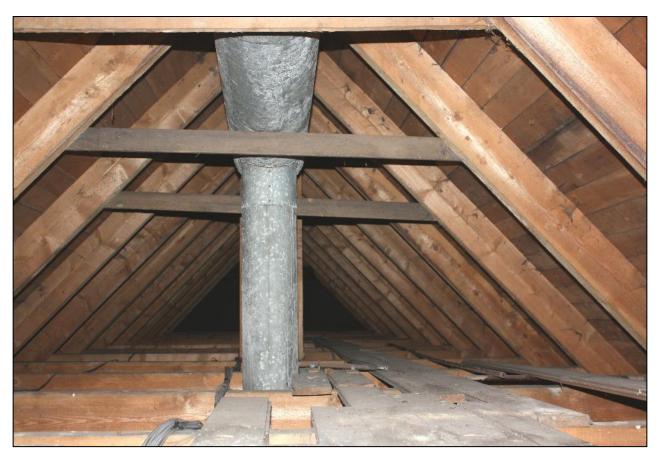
View looking towards the south-west end of the chapel's attic showing closely spaced trusses with simple collars and pipe-work for the ventilation system.
